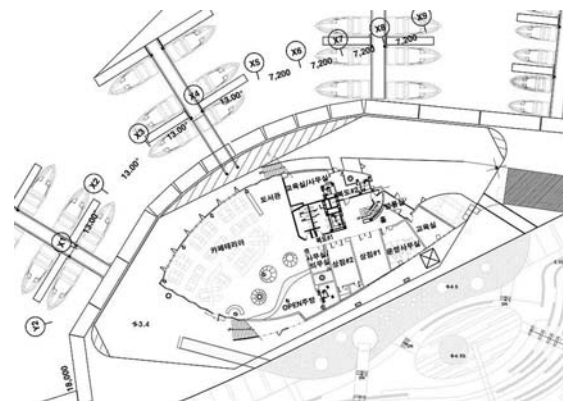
1<sup>st</sup> Floor Plan of Seoul Marina
